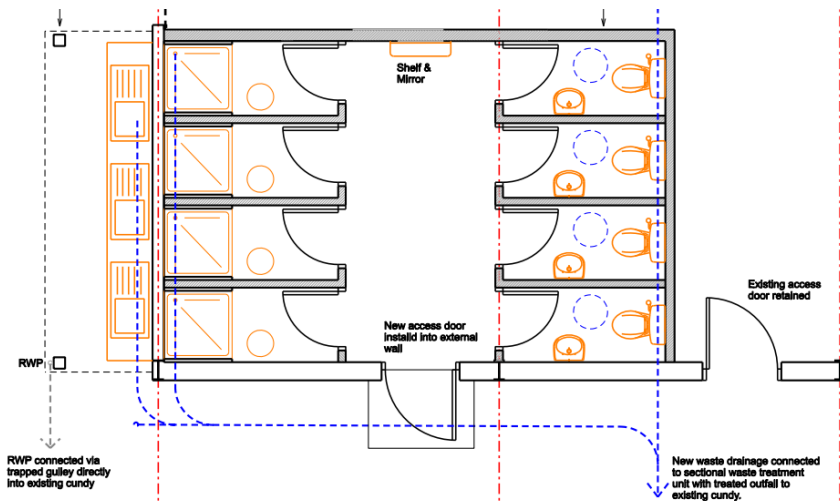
Extract from the proposed floorplan of the corner of the barn showing the location of the proposed facilities. The figure is orientated with the sinks on the south elevation and the new entrance door in the east elevation.
